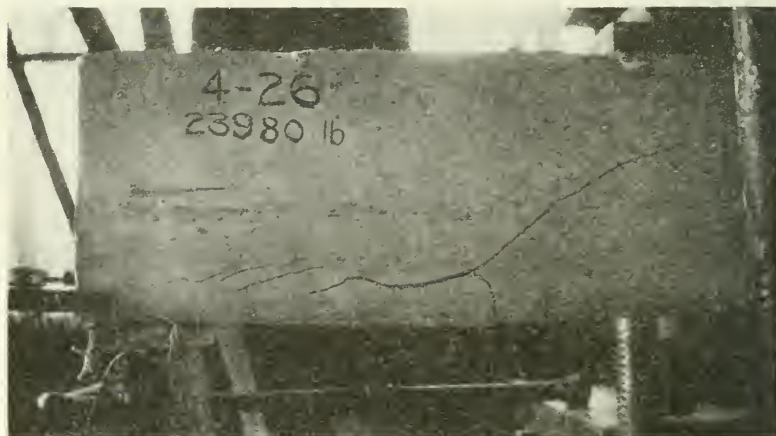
Typical Diagonal Tension Crack in Rectangular Beam
